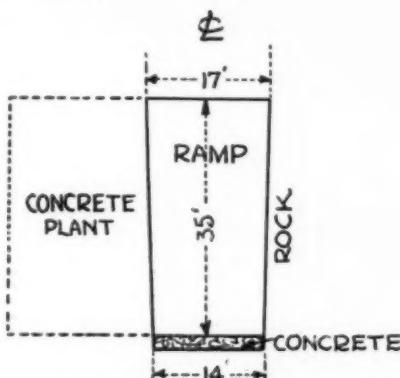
SECTION A-A, SHOWING A CROSS-SECTION OF RAMP
